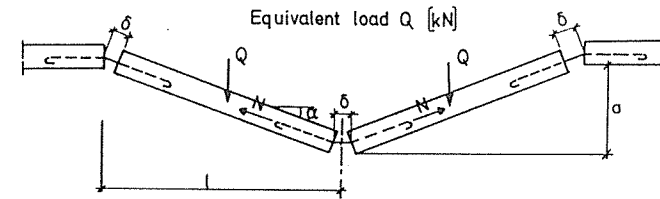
Catenary action of a longitudinal strip of a floor slab after loss of an internal support.
